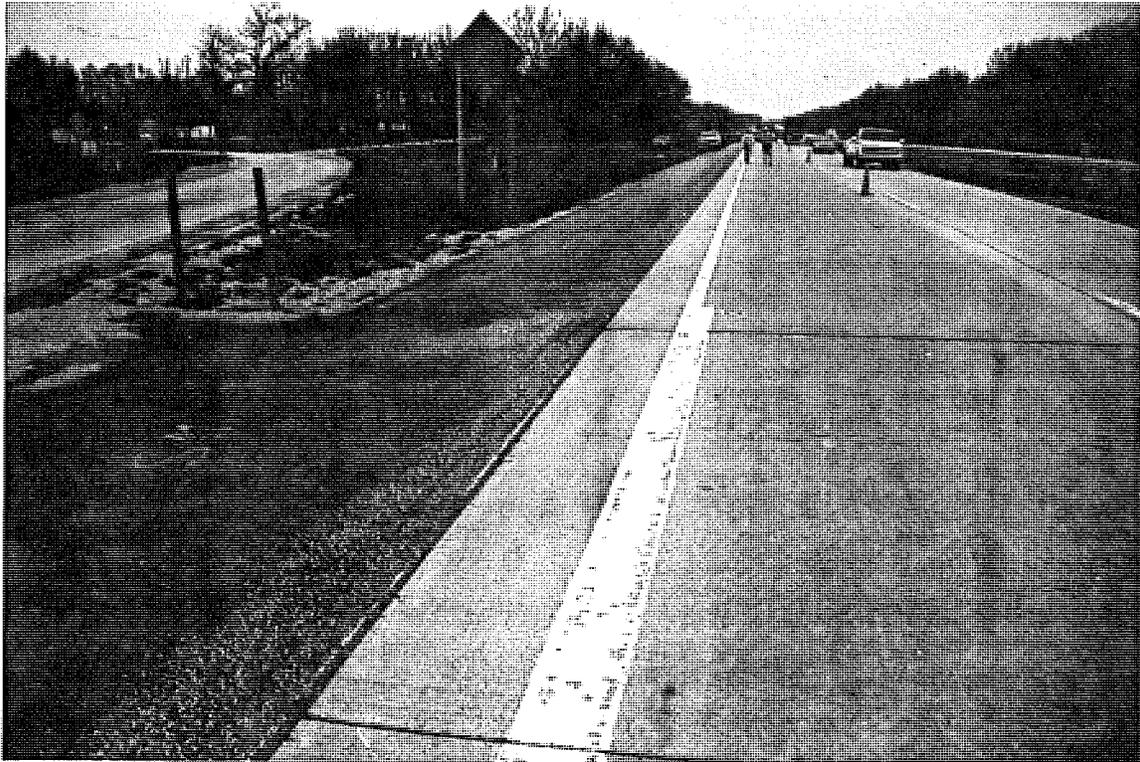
An overview looking west on CSN# 11017-32516A (Section C), EB. This section has a 14 ft widened truck lane and an asphalt shoulder. Transverse joint spacing varies from 15 to 17 ft.
